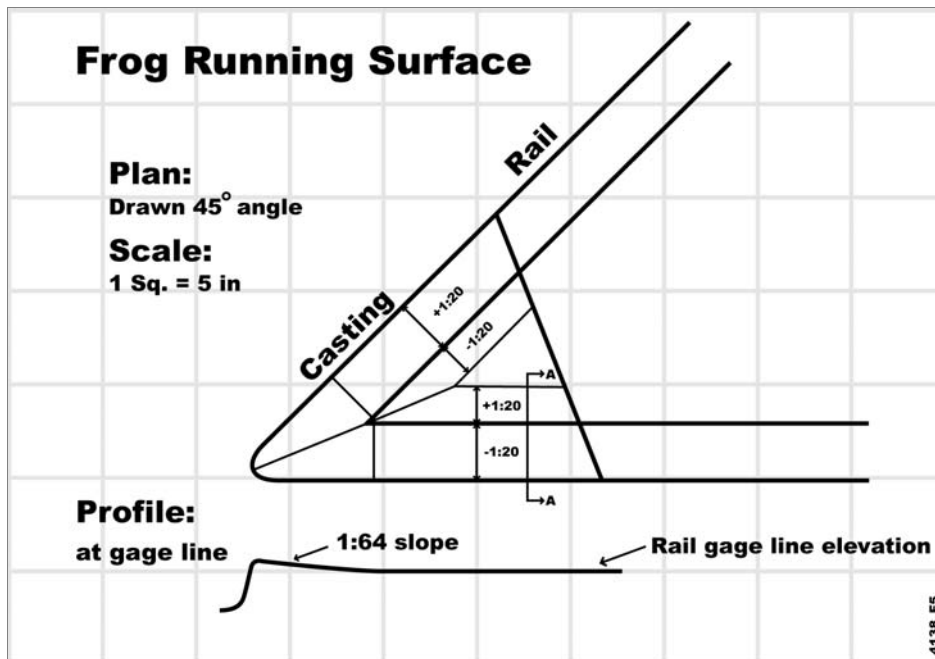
Conceptual Plan and Profile Views of Frog Point with Ramps
